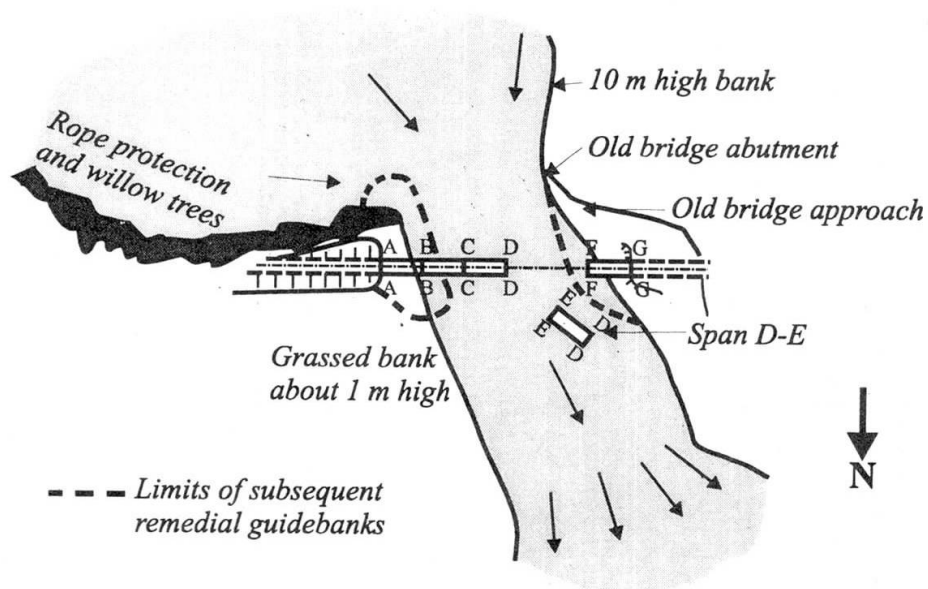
Schematic Site Plan of the Waitangitaona River Road Bridge Failure
